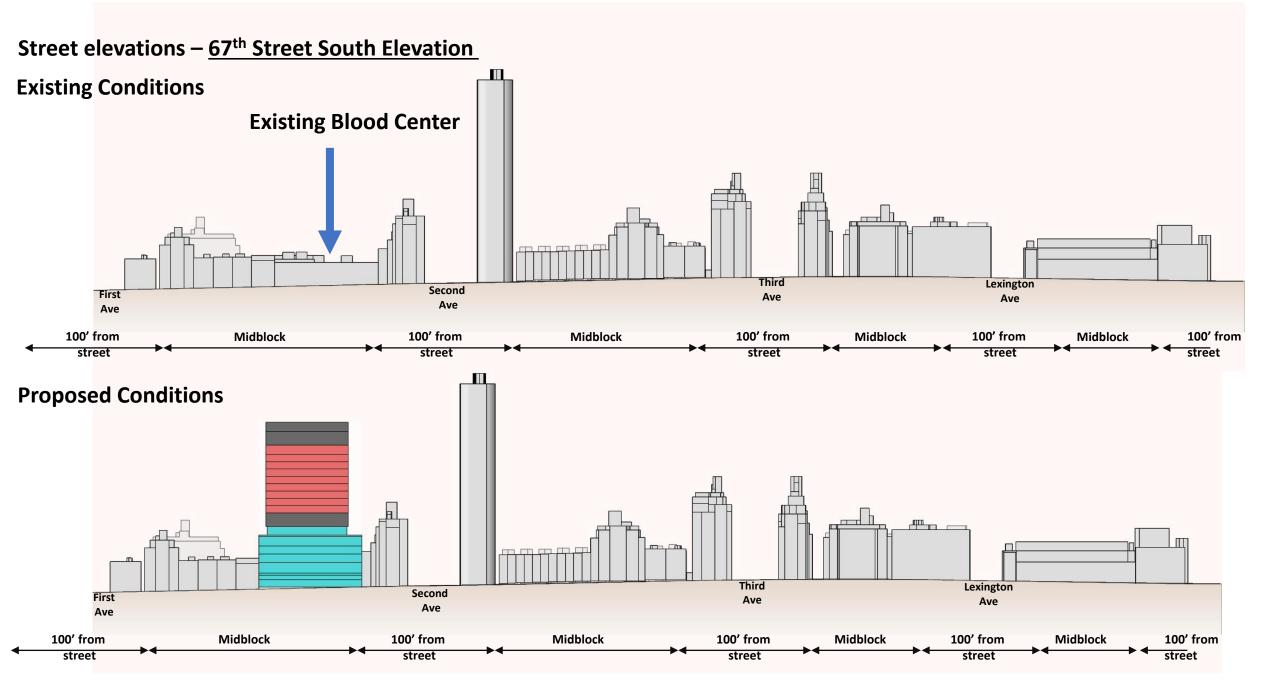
Exhibit B: Distribution of tall buildings on wide streets with lower scale on narrow streets
